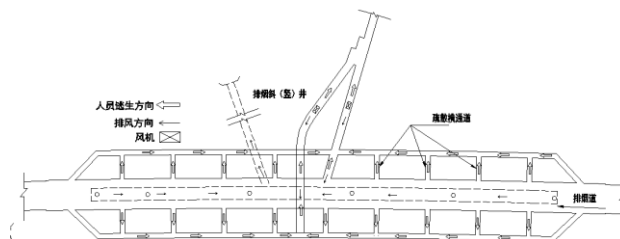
Schematic of layout planning in subgrade connecting continues railway tunnel
